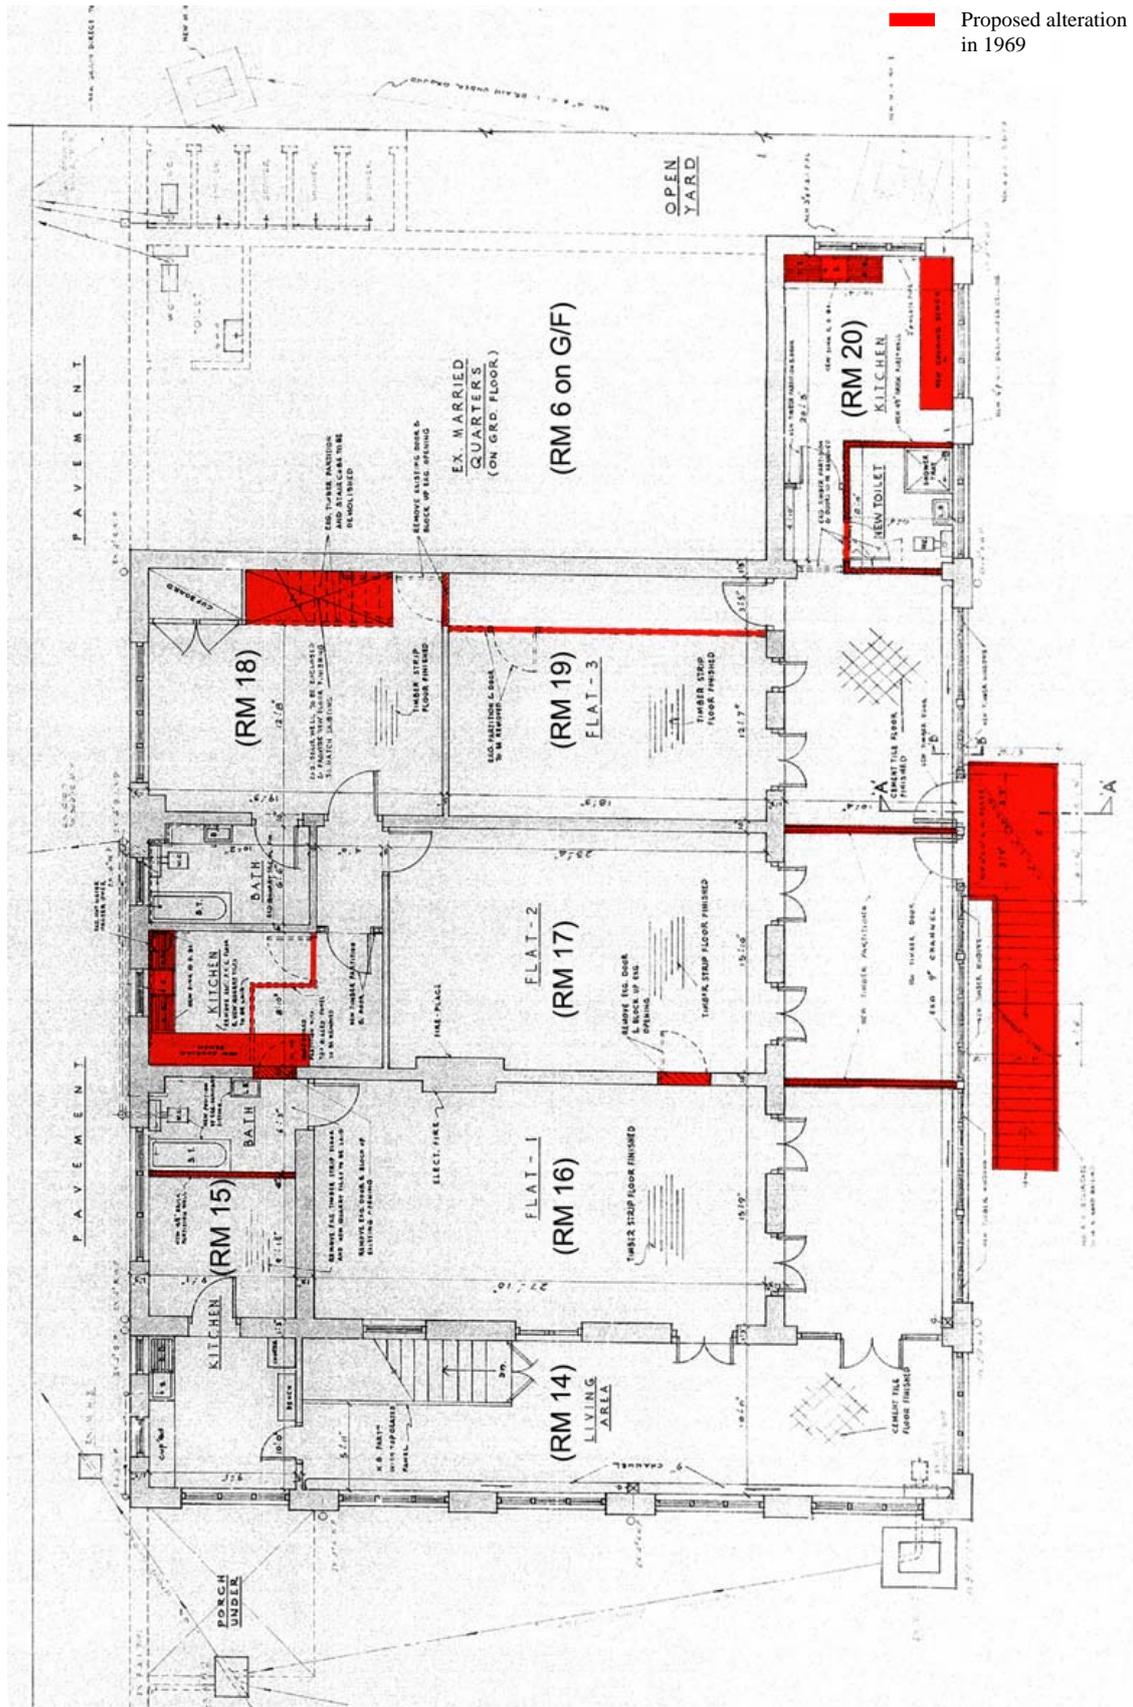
First floor plan of the main building for the proposed conversion to staff quarters at the Government Stores in 1969.
